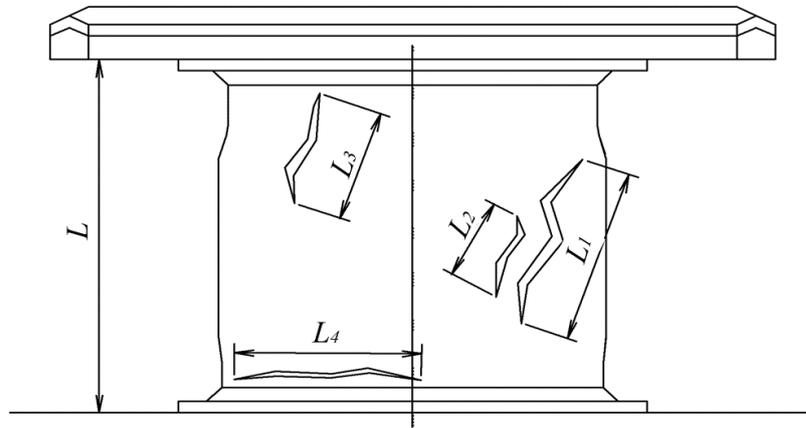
Damage measurement (Circular shape with panel)
